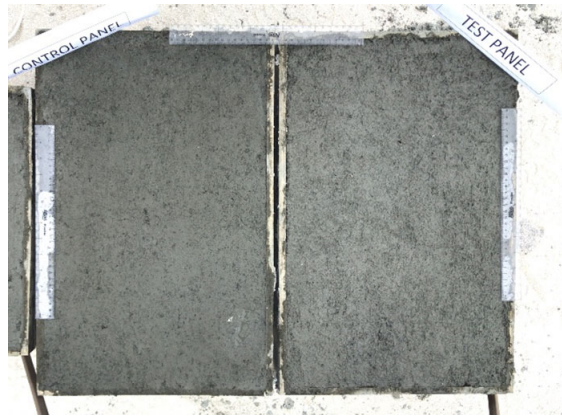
Plan view of the test setup for the monitoring of shrinkage cracks
